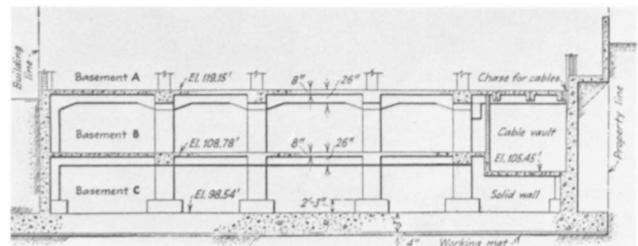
Albany, Bell Telephone Building, Voorhees, Gmelin, and Walker, Architects, 1929. Foundation section (*Engineering News Record*, 27 November 1930).
